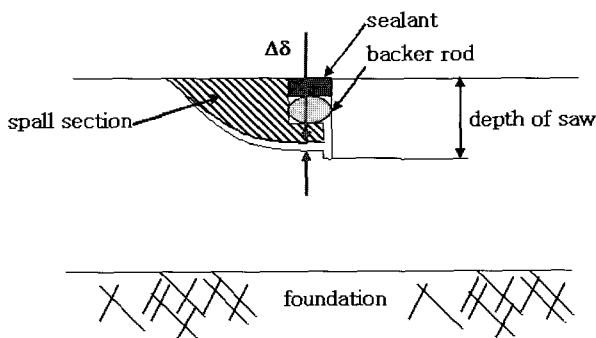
Opening of delamination in jointed concrete pavement that causes spalling distress
